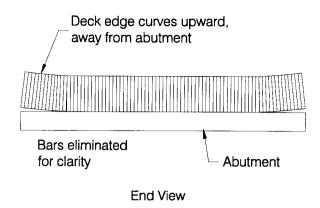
Deck distortion at the west abutment of the Decatur bridge.
